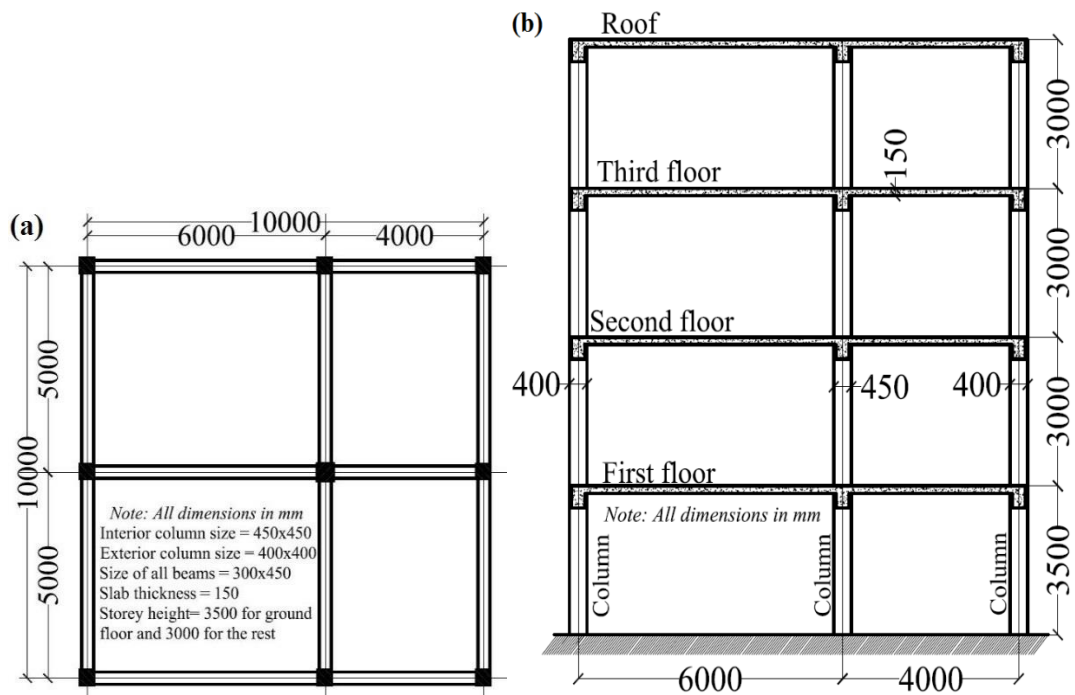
Experimental building, (a) beam column layout plan and (b) sectional elevation.
